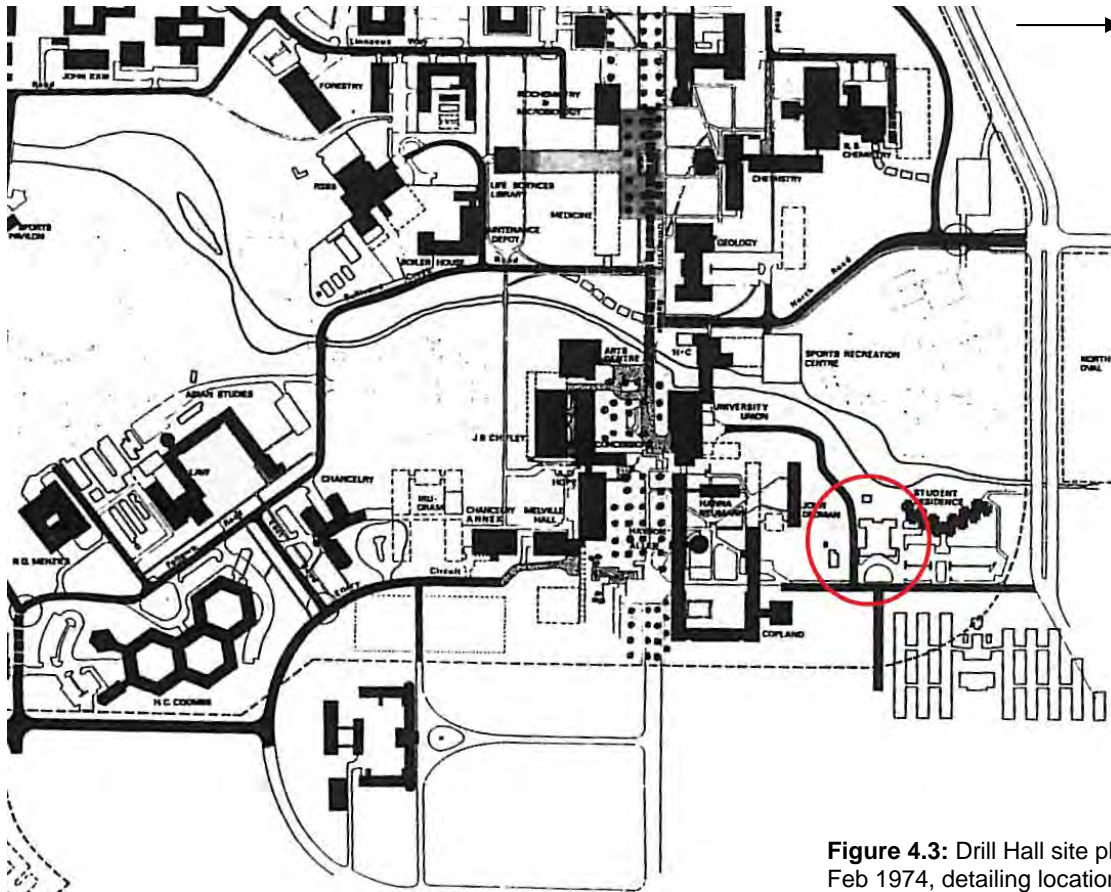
Drill Hall site plan, Feb 1974, detailing location of residential cottage to the south and other associated sheds (Dexter 1978: Pl. 3).
